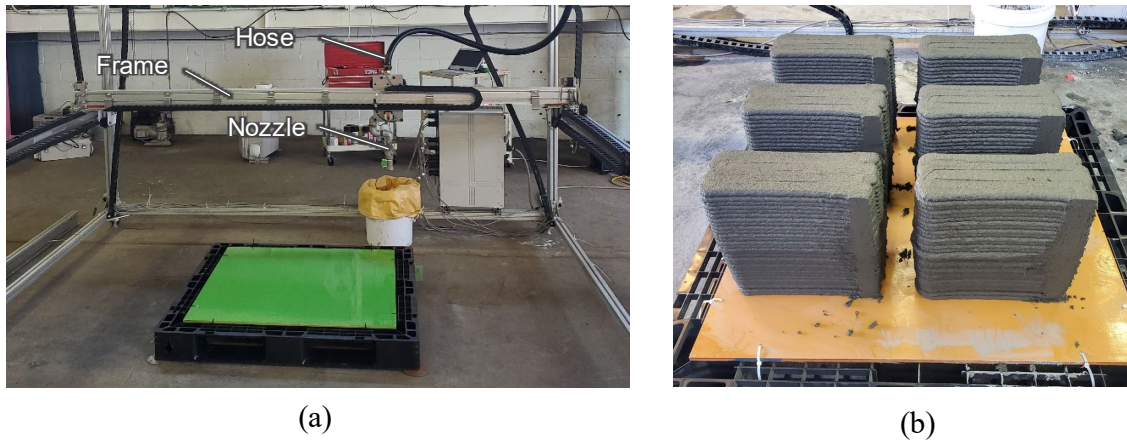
Outline of 3DP specimen: (a) 3D printing equipment; (b) Overview of specimens
